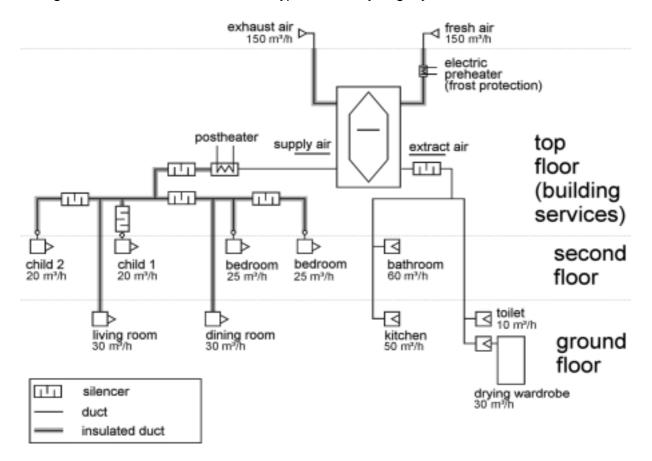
Ventilation system duct network plan for Passive House type "Jangster de Lüx" with the design layout flow volumes
